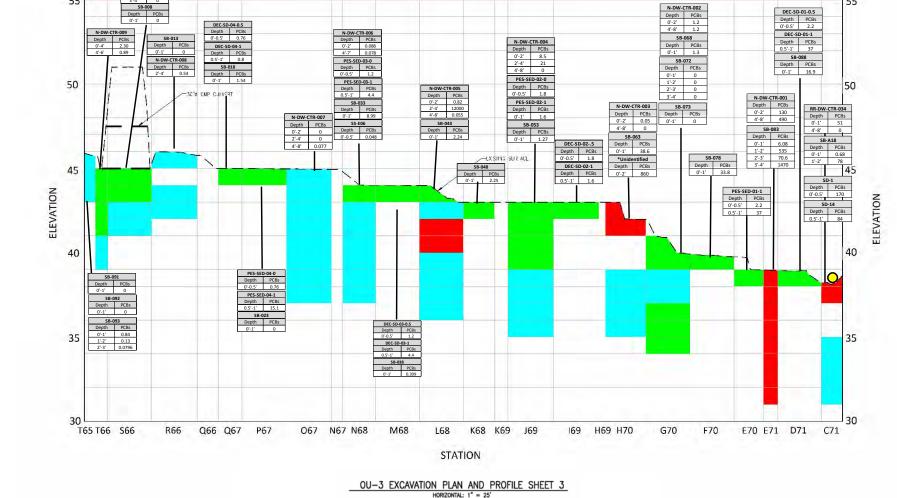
OU-2 and OU-3 Proposed Excavation Boundaries and Depths - South FORMER ADIRONDACK STEEL OU-2 AND OU-3 (Site No. 401039) COLONIE, NEW YORK
